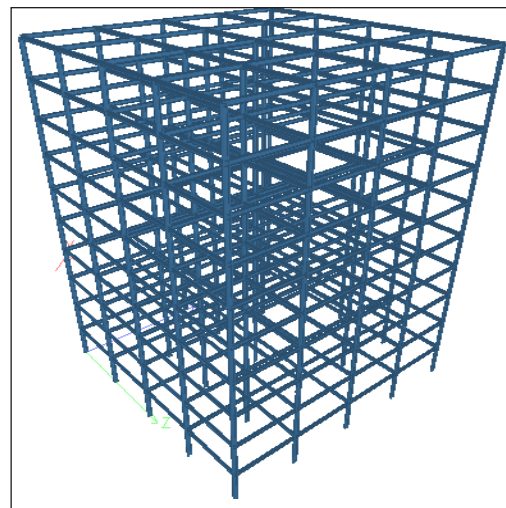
3D Isometric View of Steel Structural Framing of 10 Storey Building
